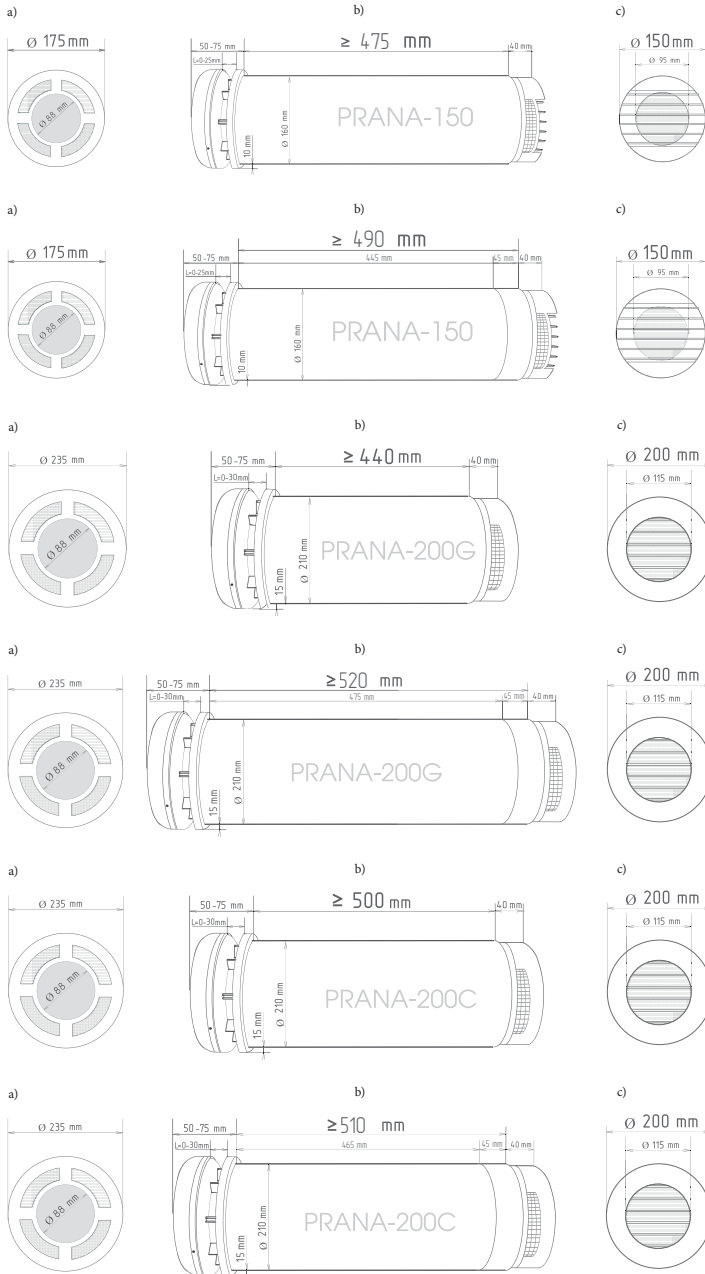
The overall dimensions and the dimensions of ventilation units "PRANA-150", "PRANA-200G", "PRANA-200C":
